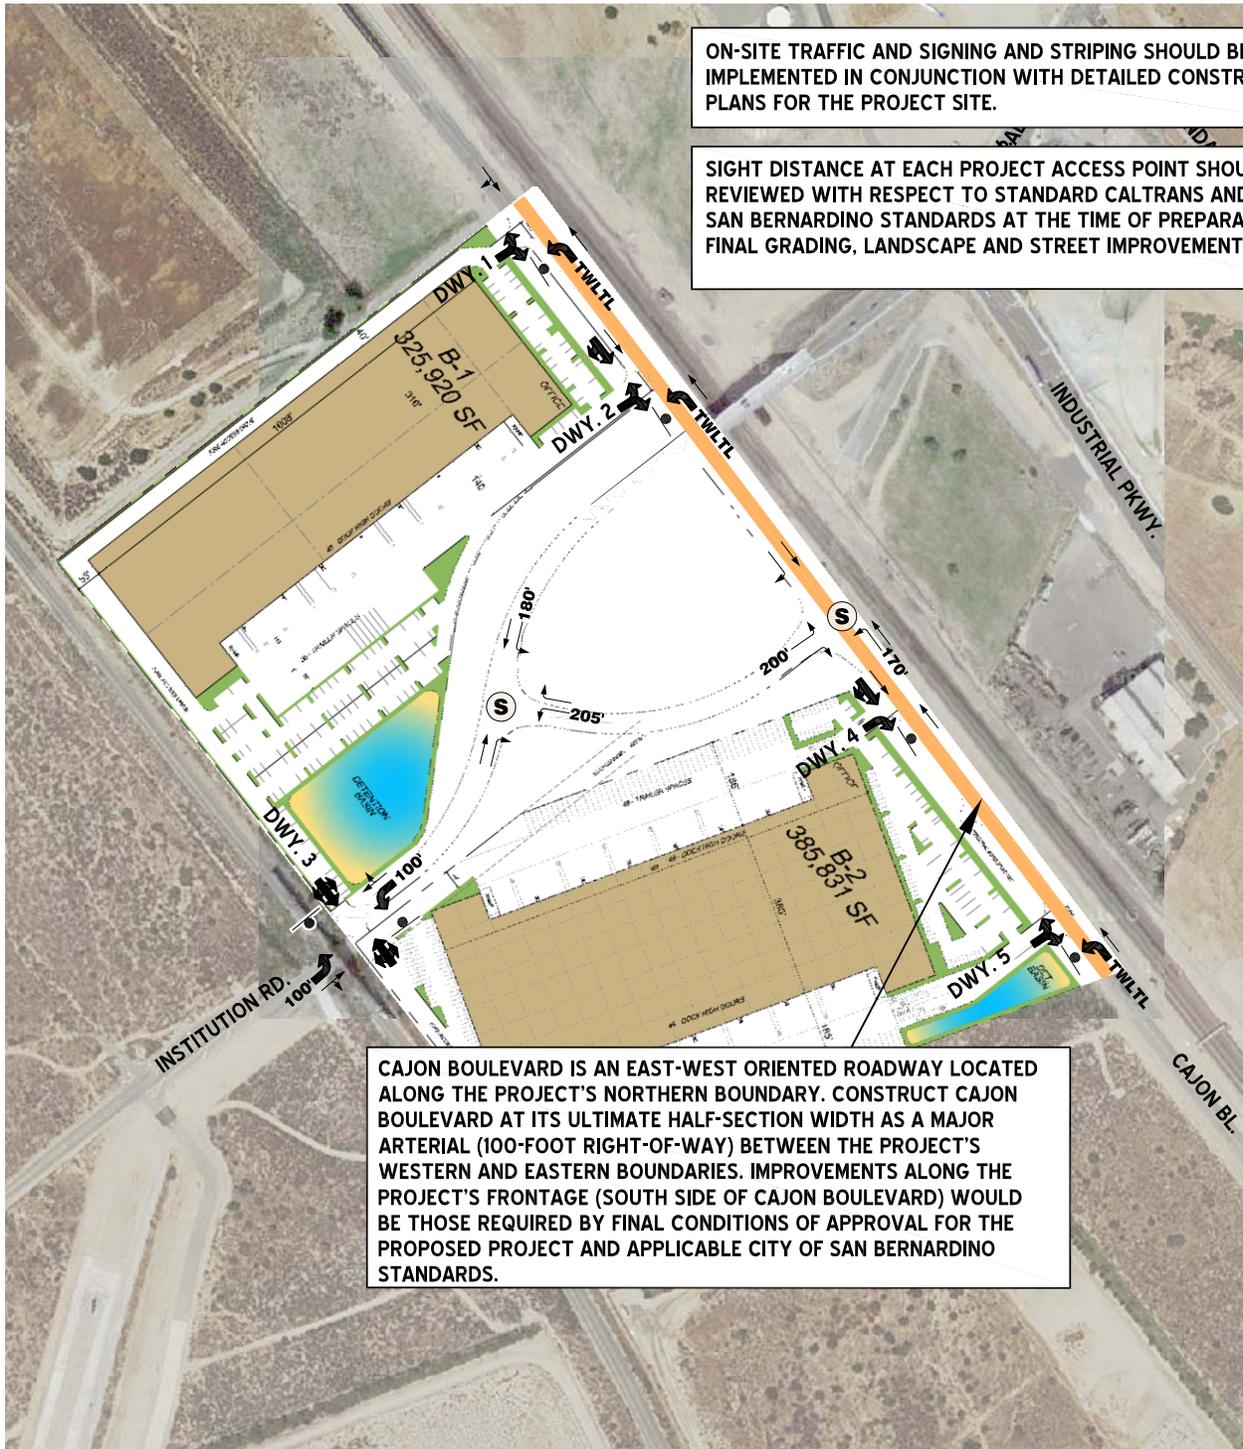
also illustrates the on-site and site adjacent recommended roadway lane improvements. Construction of on-site and site adjacent improvements are recommended to occur in conjunction with adjacent Project development activity or as needed for Project access purposes.
